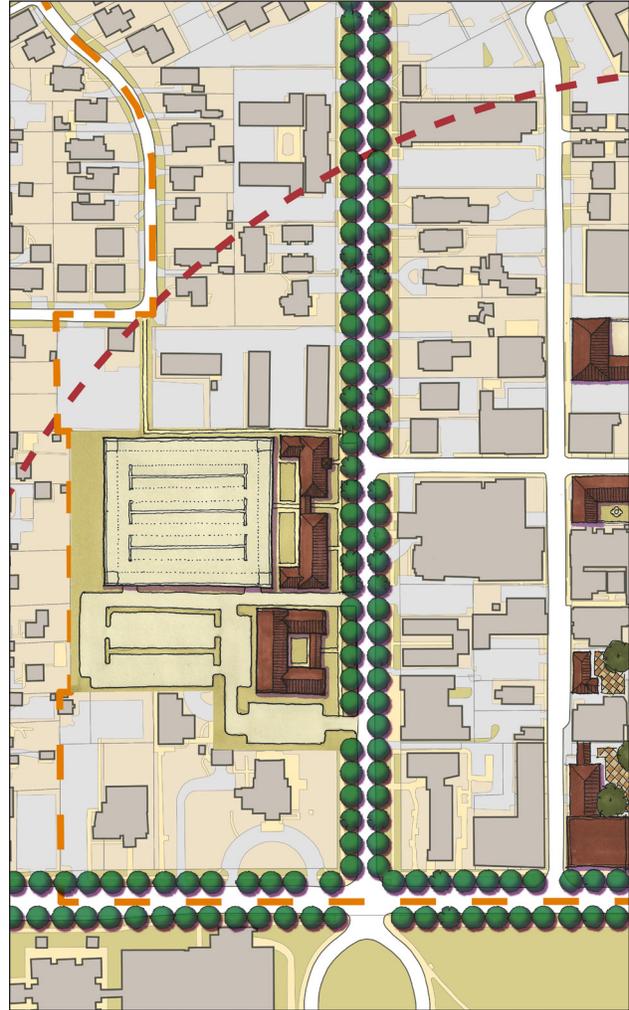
Parking garage off University, north of Boyd. Buildings line the street frontage, while the parking garages are positioned in back
